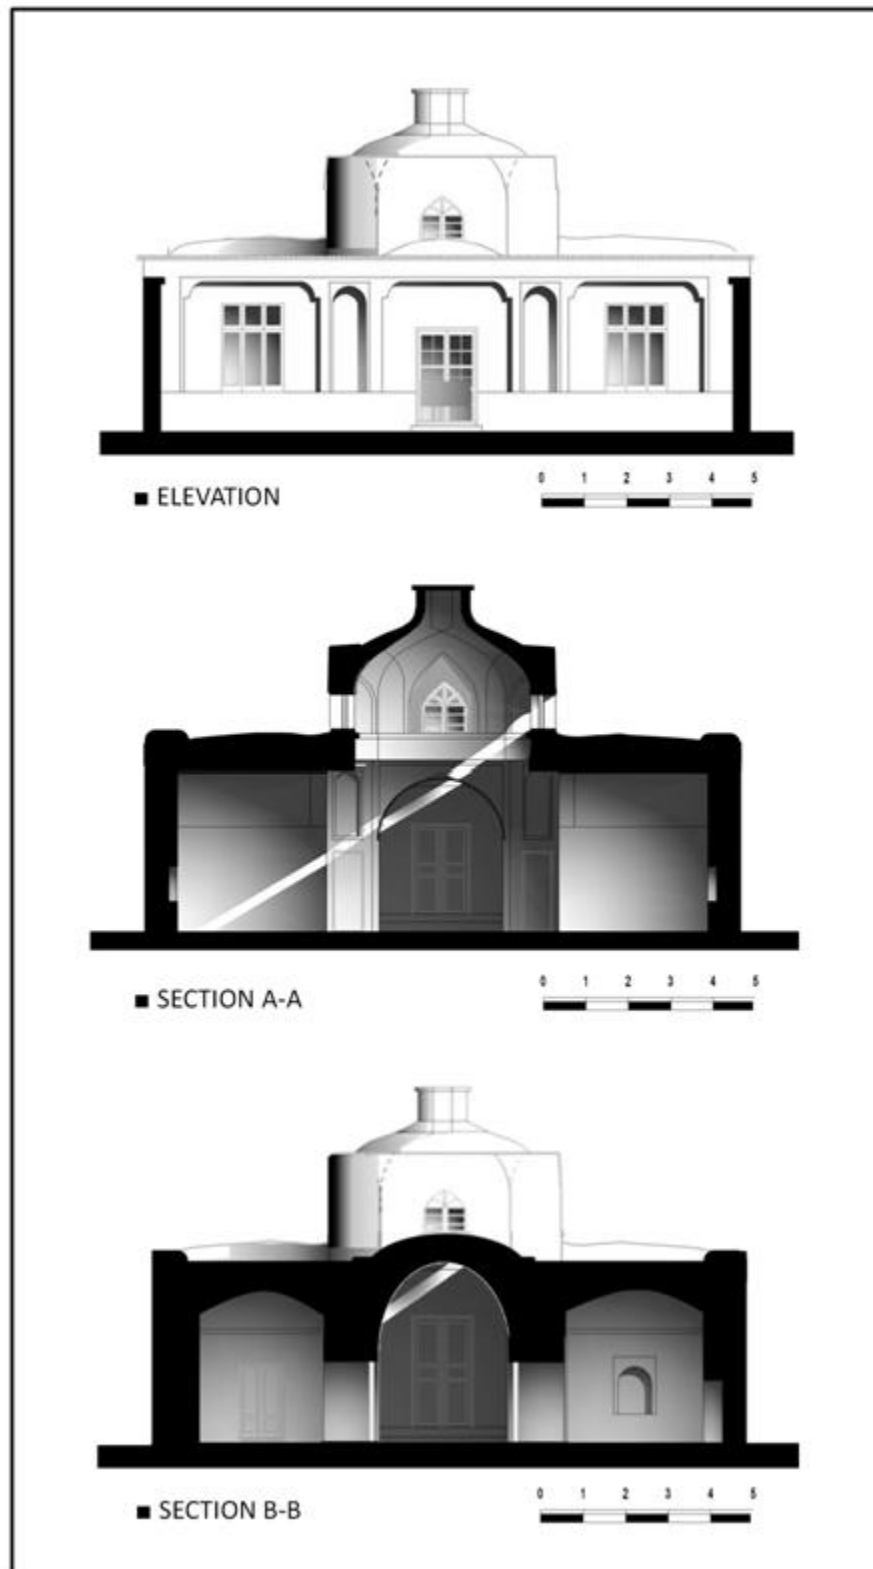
estimated elevation and sections of the Dareini house (Estaji, 2010) and the local Archives of SCHO
